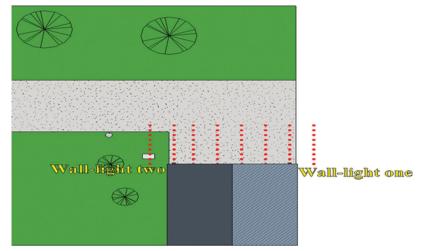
Layout and measuring grids of garage wall luminaires.
